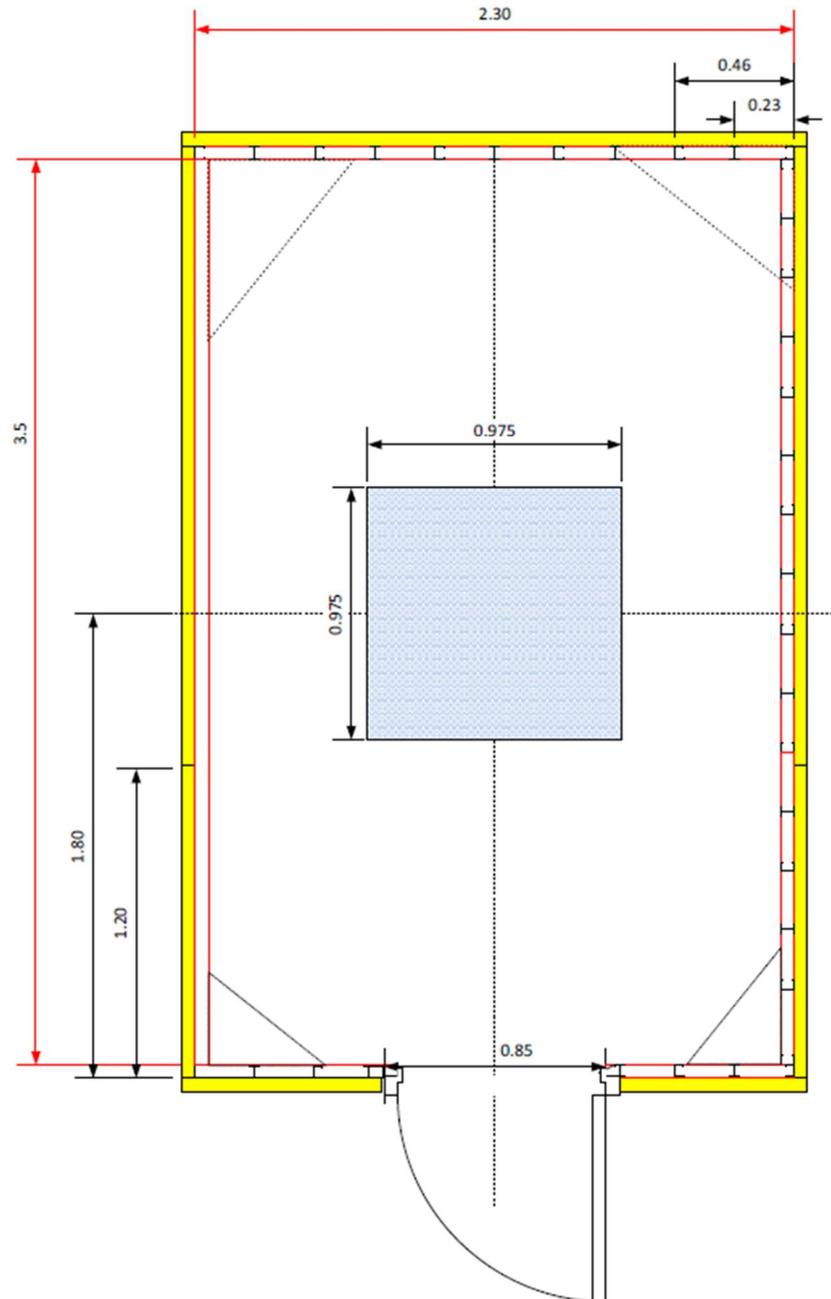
Test room – Plan. Details of test room and location of wind catcher tower in roof.
